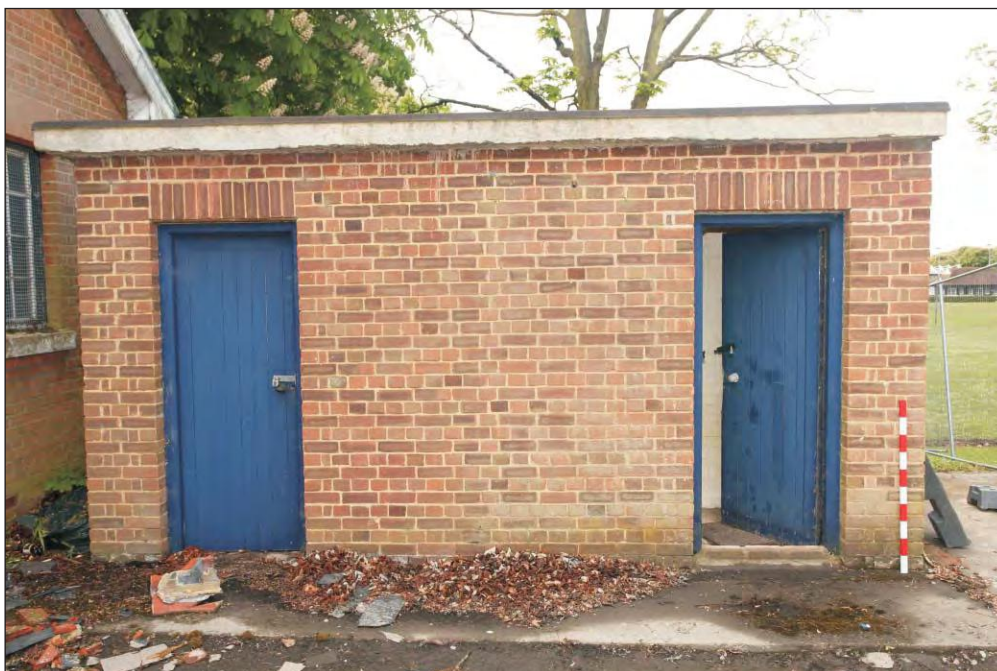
Building WA O 215 - Toilet Block viewed from the north-east
